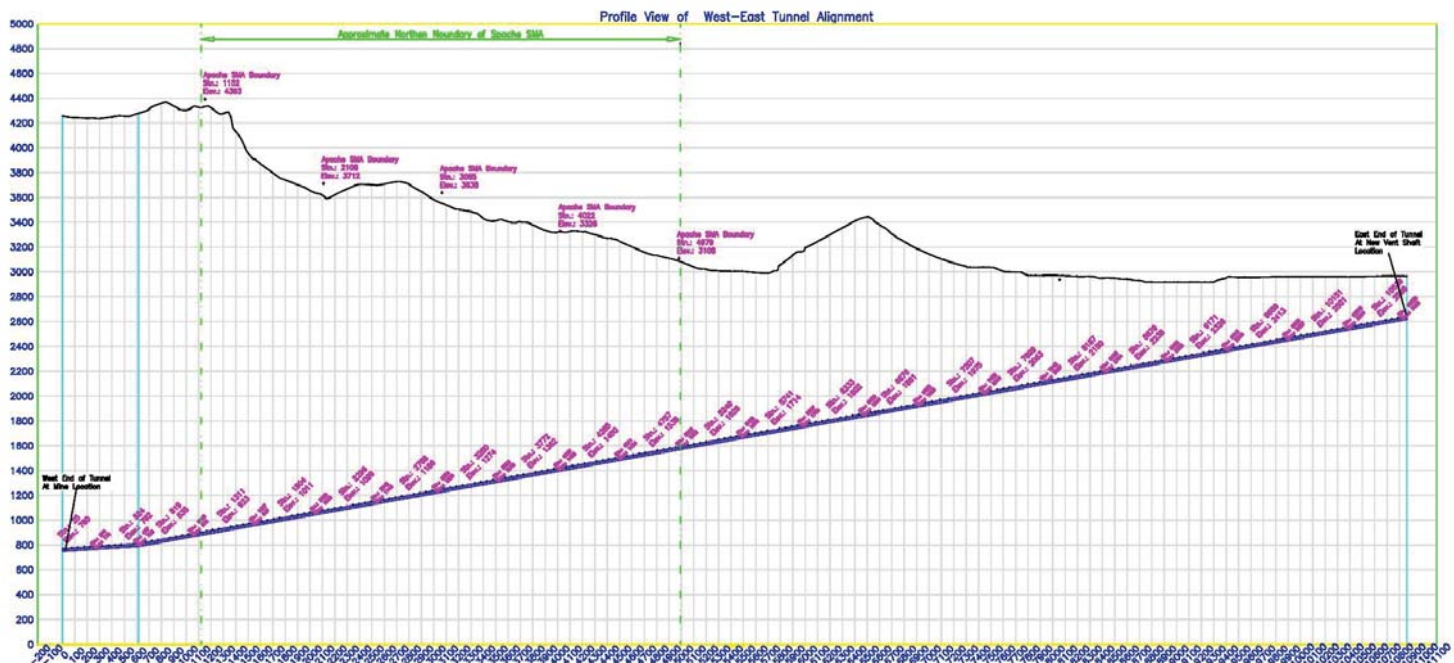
Longitudinal Profile Along West-East Tunnel Alignment
